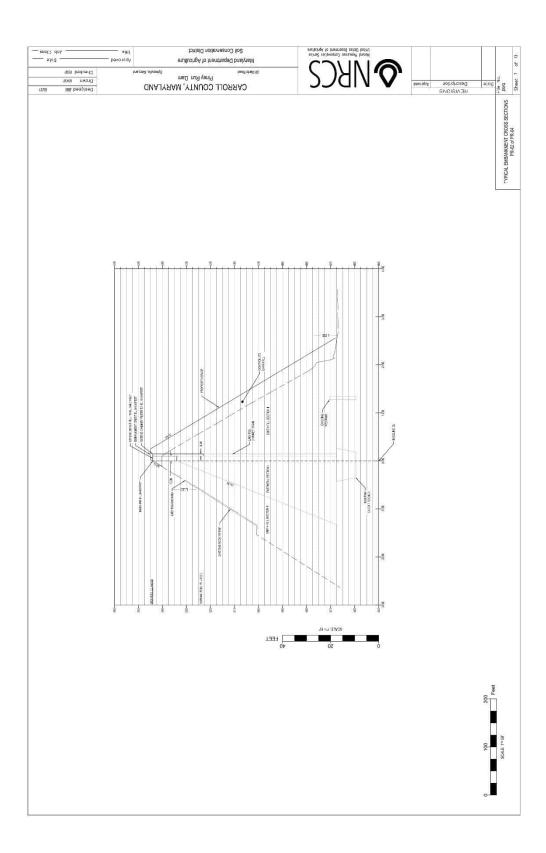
Piney Run Dam Alternative 1 Auxiliary Spillway Profile
